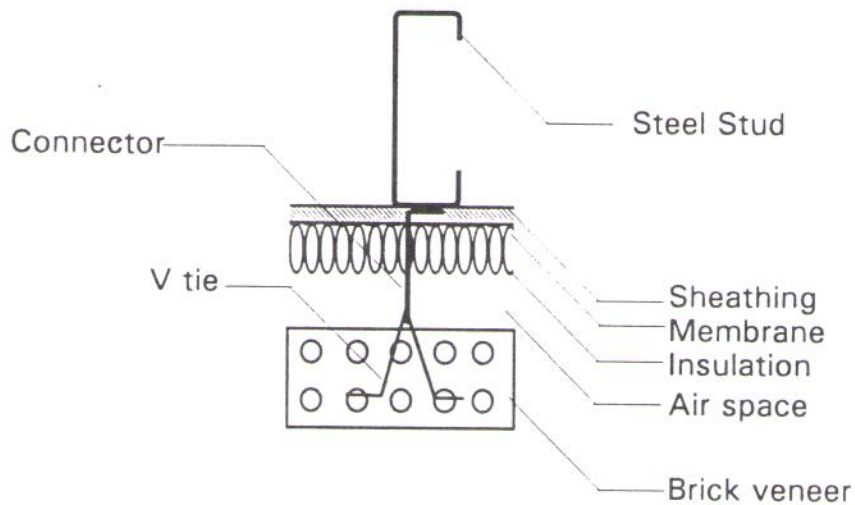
Typical Location of Retrofitted Ties in Brick Veneer Steel Stud Wall System
